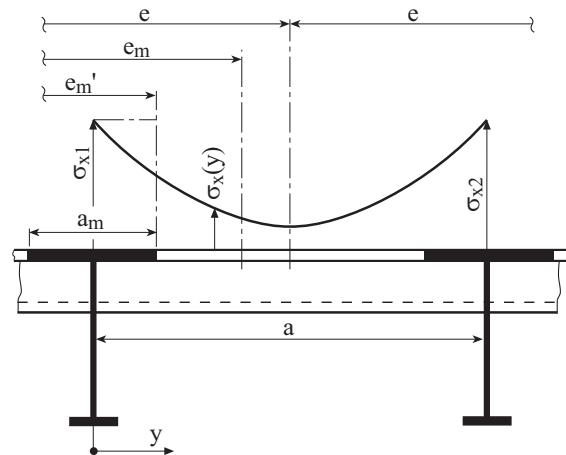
Effective width e'_m of stiffened flange plates of girders
